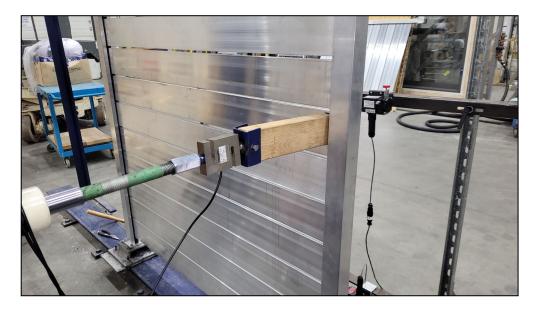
Privacy Wall (Deck Mount) – Horizontal – Adjacent to Post Concentrated Load
